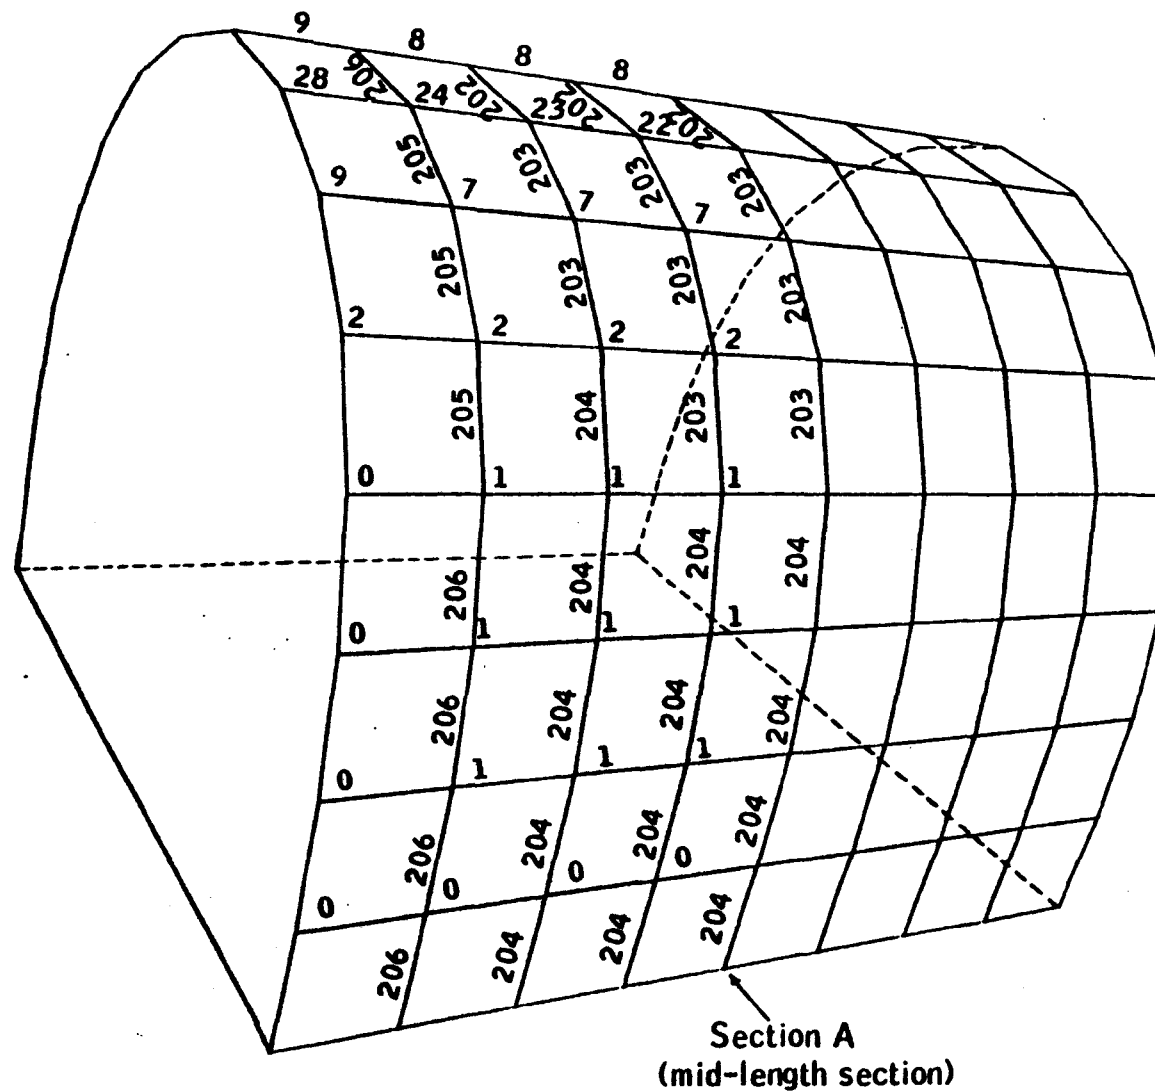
1 - Tension forces in the cables (in kN)
